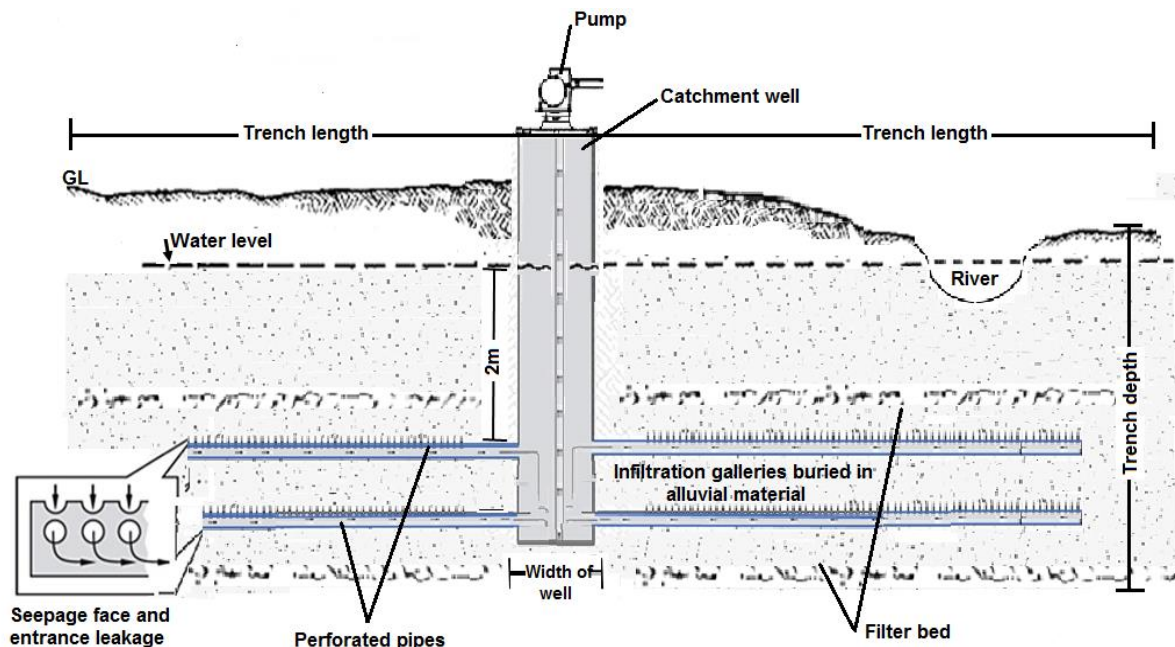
3 Cross Sectional details of Infiltration Galleries (Source: authour's construction)
